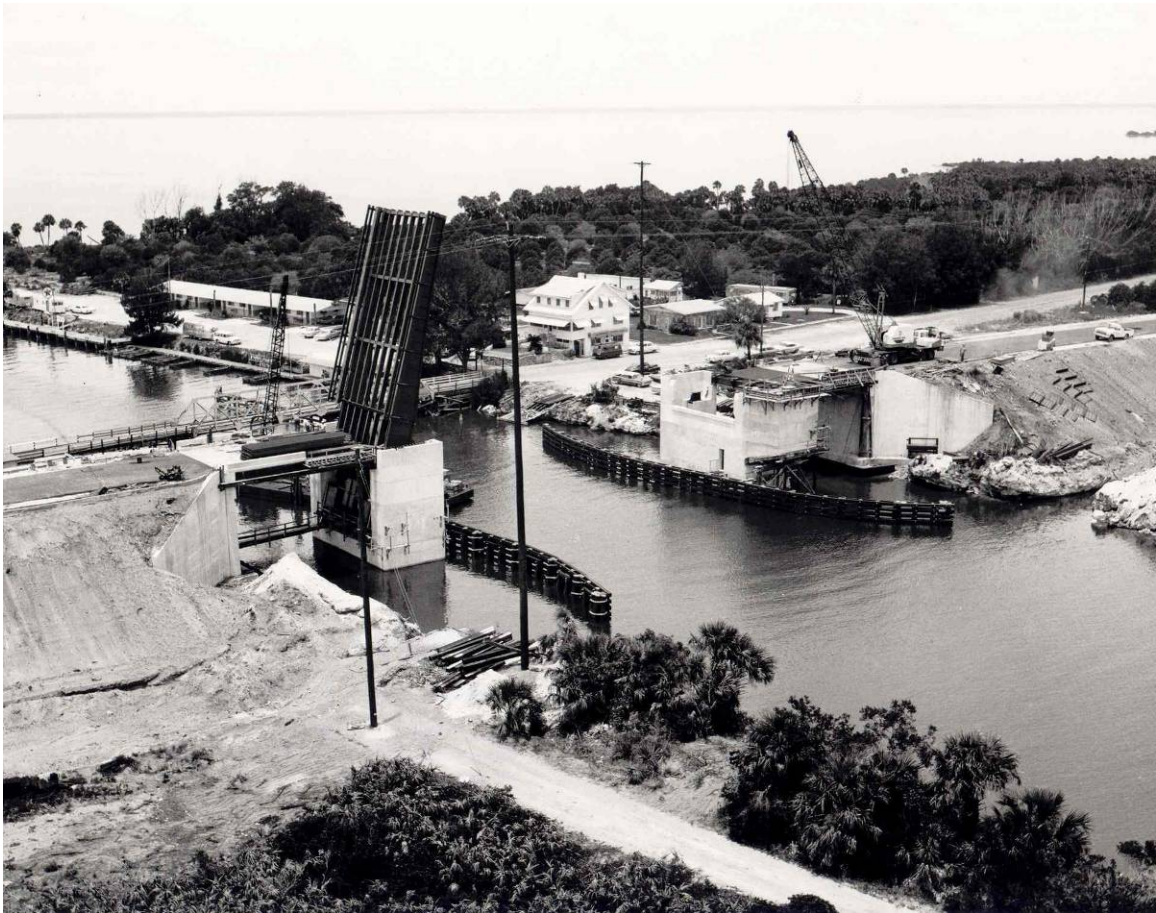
Construction of the Haulover Canal Bridge, camera facing west, June 9, 1965.
